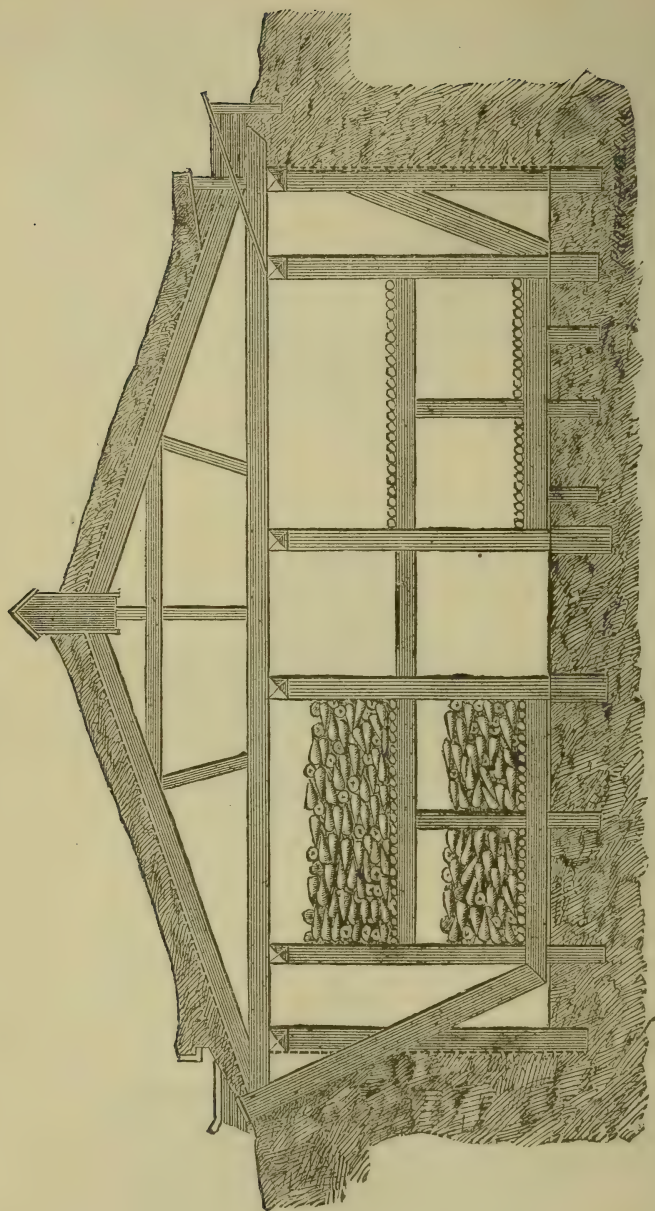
Preserving cellar (Wahlkoff). Russian plan, vertical section.
